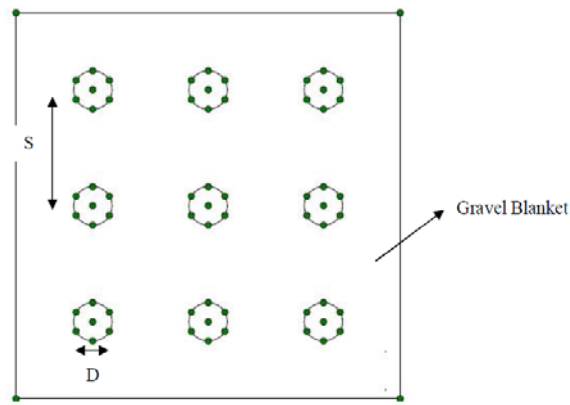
Plan of Stone Columns and The Gravel Blanket
